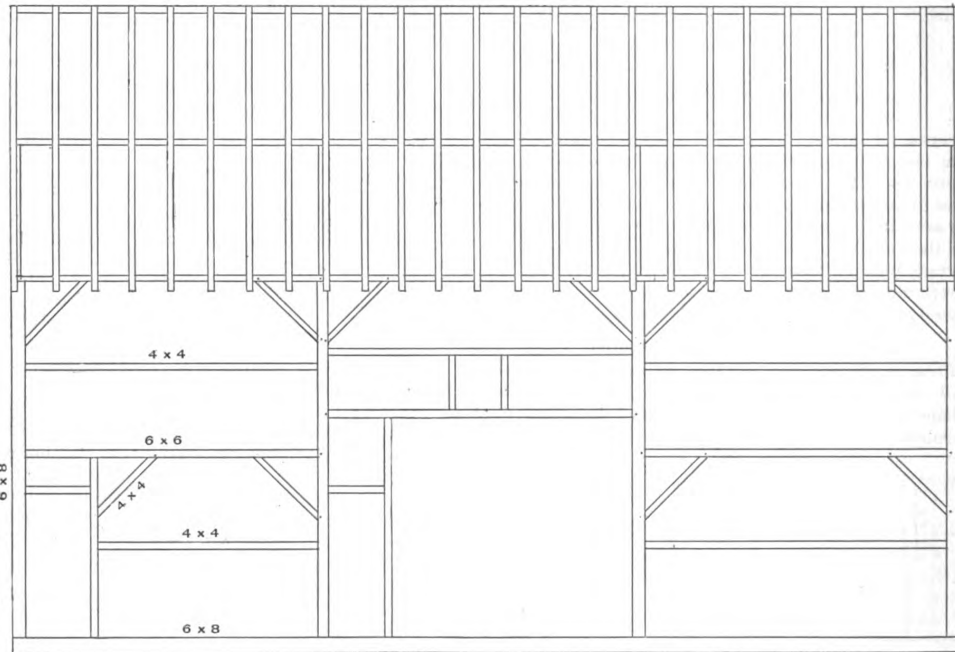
Method of Drawing the Right Side Elevation of Frame.—Scale, $\frac{1}{8}$ Inch to the Foot.
